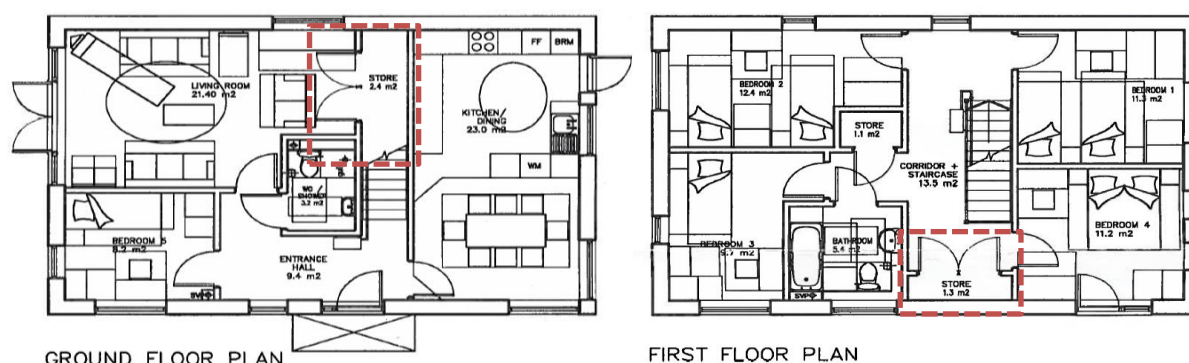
House 2 ground floor and first floor plans. Spaces where minor deviations were identified are marked in red frames.
